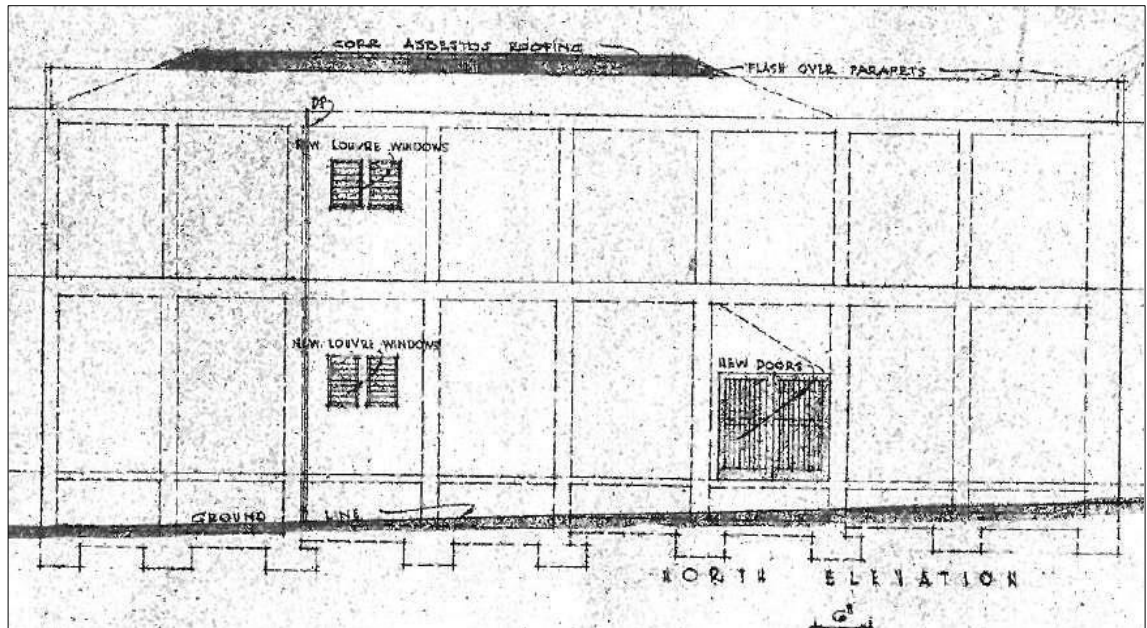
Bradley's Building North Elevation, March 1955. Source: WC Archives 00056:508:B38052
